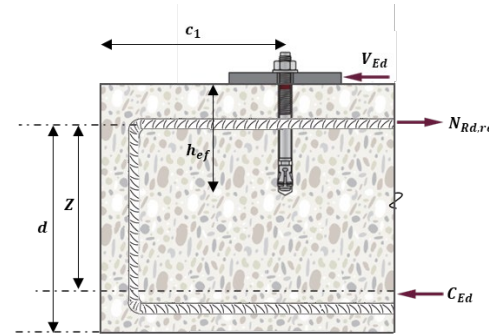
Tension force in anchor reinforcement developed to take up shear loads
